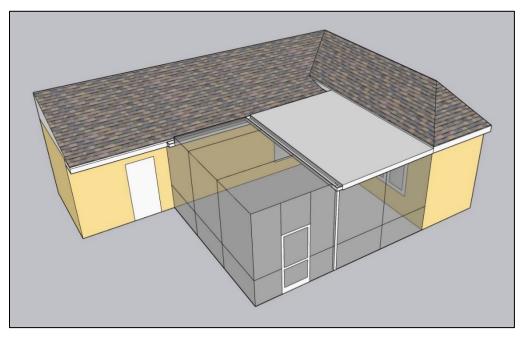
Proposed rear, screened in patio. The patio roof will be installed below the drip edge on the main roof structure.
